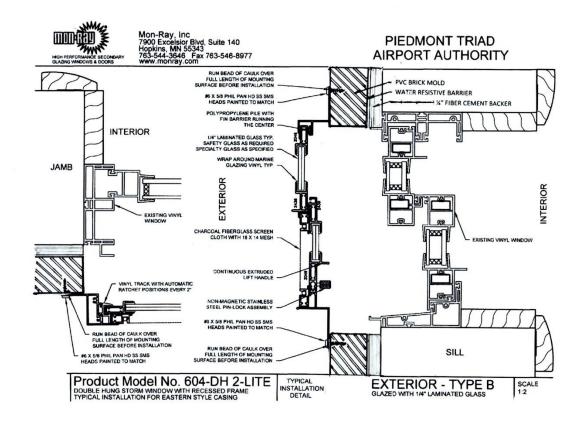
Detail of Exterior Acoustical Storm Window Installation in Cement-Fiber Replacement Siding with Backing Layer
